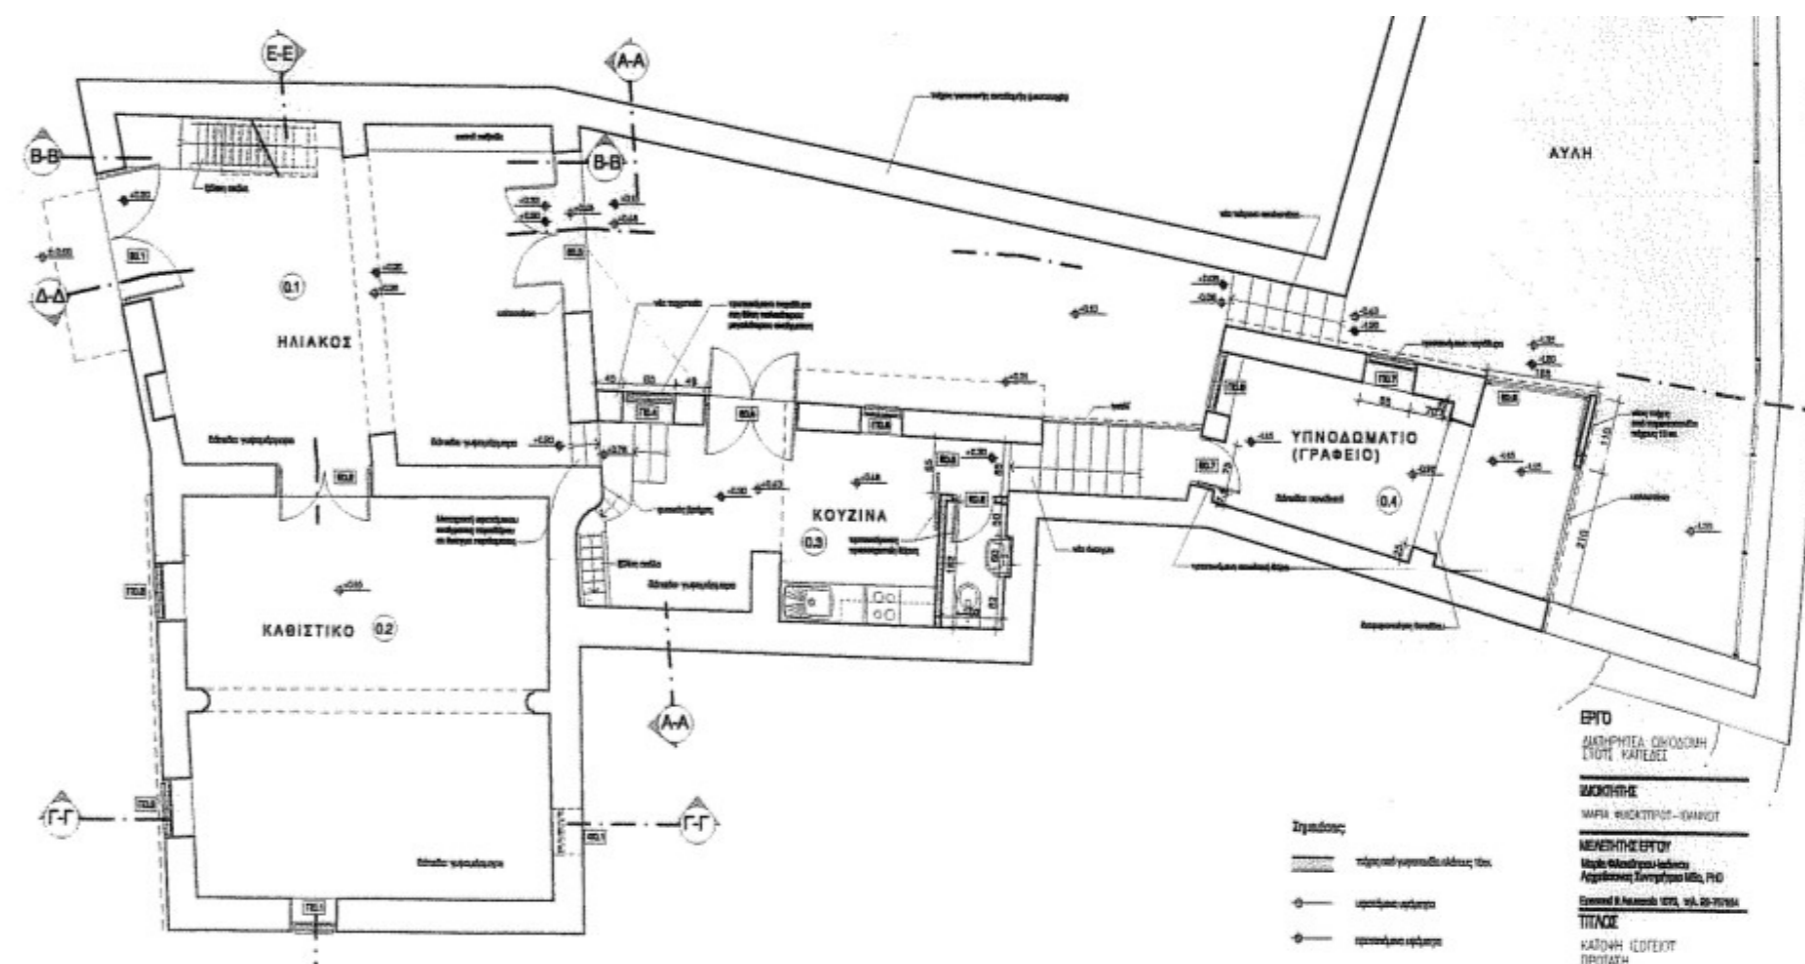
Plan of the ground floor of the vernacular dwelling – Proposal for the restoration and reuse. © M. Philokyprou
